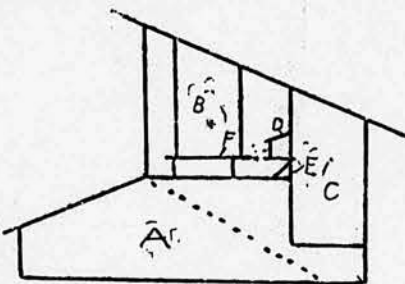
Fig. II. shows cross section of house, from which will be seen position of floors to roosting-rooms and hallway. A. is the scratching-room, extending full width of building, 8x18 feet, and under hall floor. B. is the roosting and nesting-room; C. the hall or passageway; D. shows position of nests, which open into hall to gather eggs; E. is the troughs for soft food, which is reached by fowls through rack placed at an angle of 45 degrees, slats being three inches apart, giving free access to trough, but prevents getting into it with their feet, and also crowding, each fowl having an equal chance. F. shows position of roosts, which are placed from twelve to twenty-four inches from floor, according to breed.
